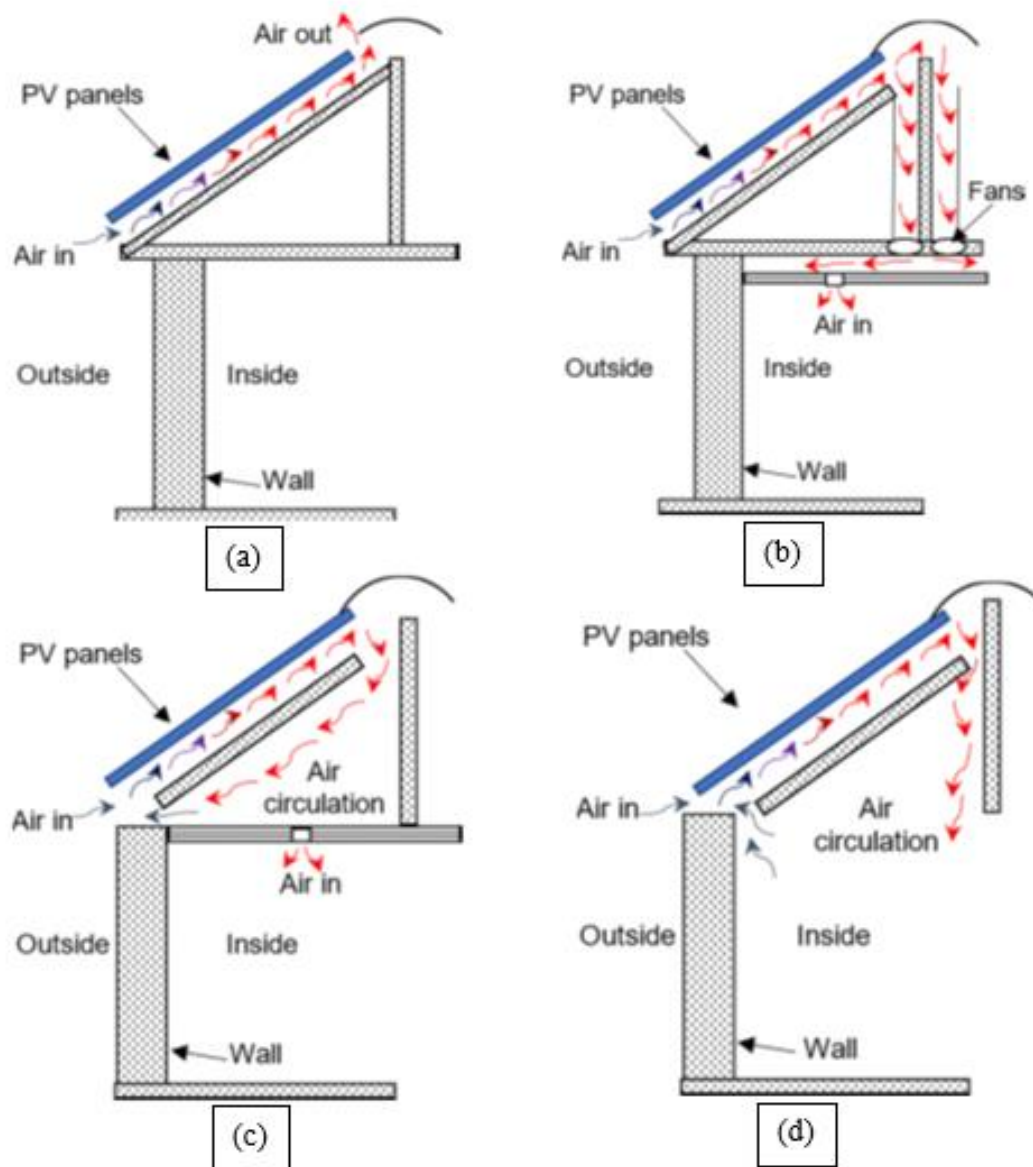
(a) BIPV roof system with gap between Photovoltaic module and structure of roof. (b) BIPV/T roof system having gap between Photovoltaic module and structure of roof, and a channel to circulate warm air into building. (c) BIPV/T roof system having gap between Photovoltaic module and structure of roof, which circulate the warm air into the building. (d) BIPV/T roof system having gap between Photovoltaic modules and the structure of roof, which ventilate heated air to building space.
